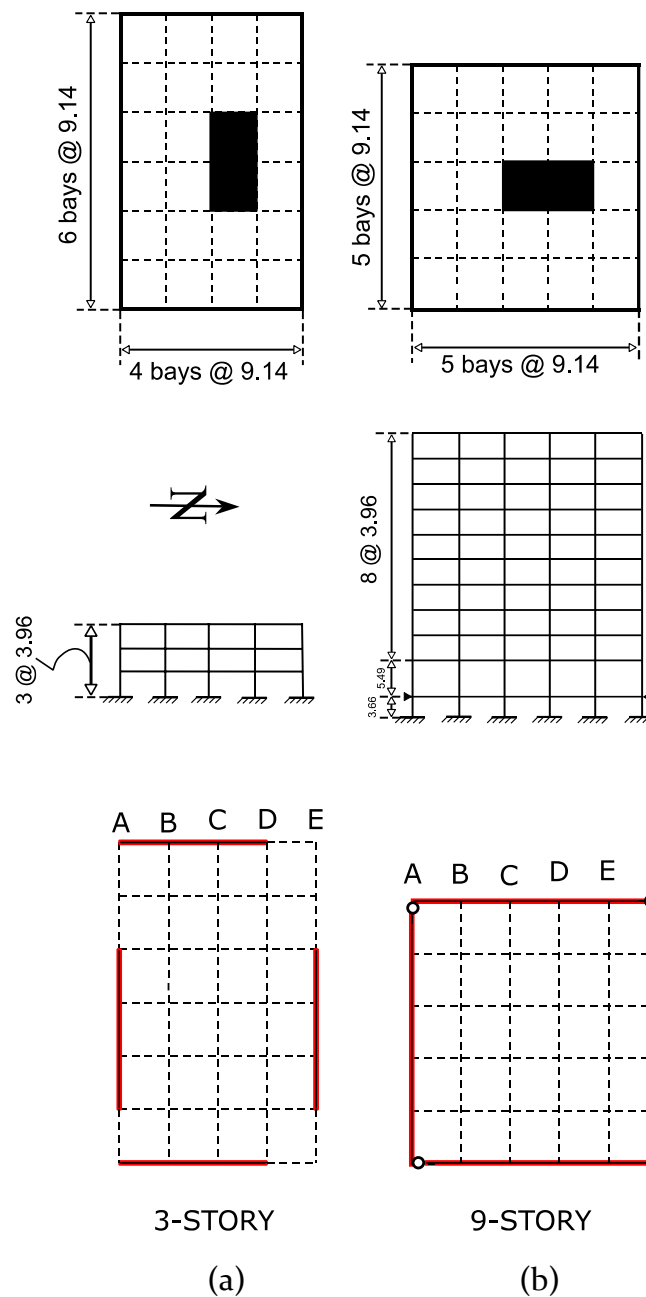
Plan view, typical floor and elevation view of the effective model of the (a) LA₃ and (b) LA₉ model buildings.
